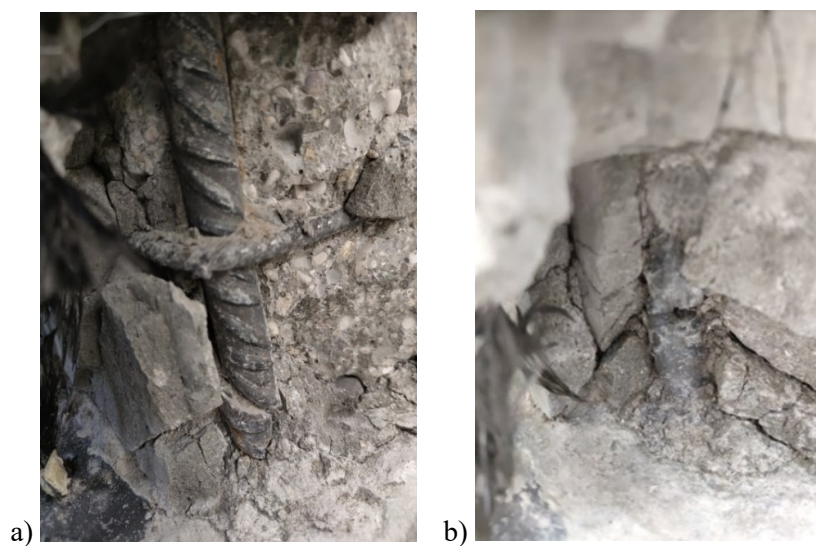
a) and b) main reinforcement bar failure (P24).
